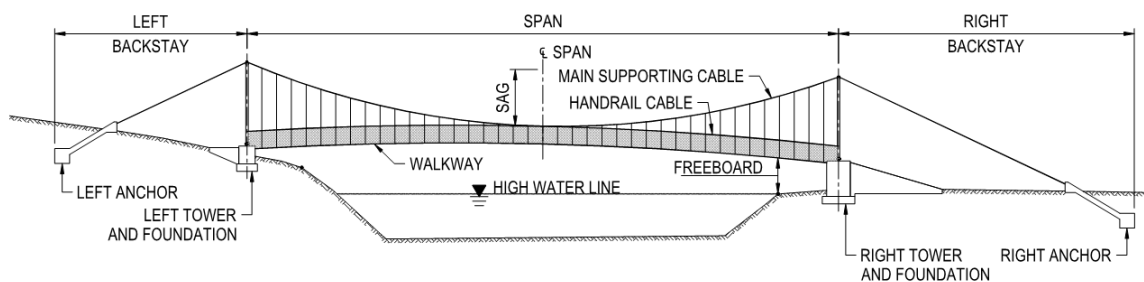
Typical Geometry of a B2P Suspension-Cable Footbridge (Bridges to Prosperity, 2016).
